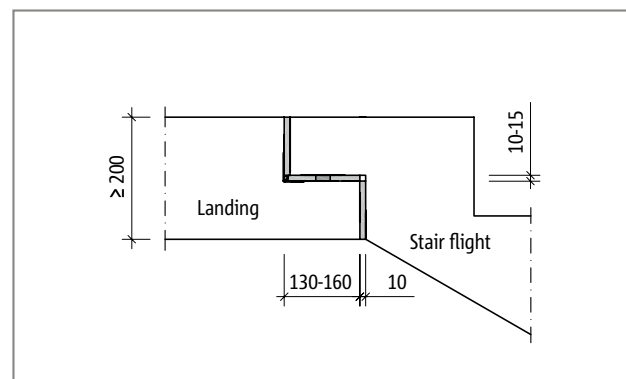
Schöck Tronsole® type F: Design variant flush stair connection
